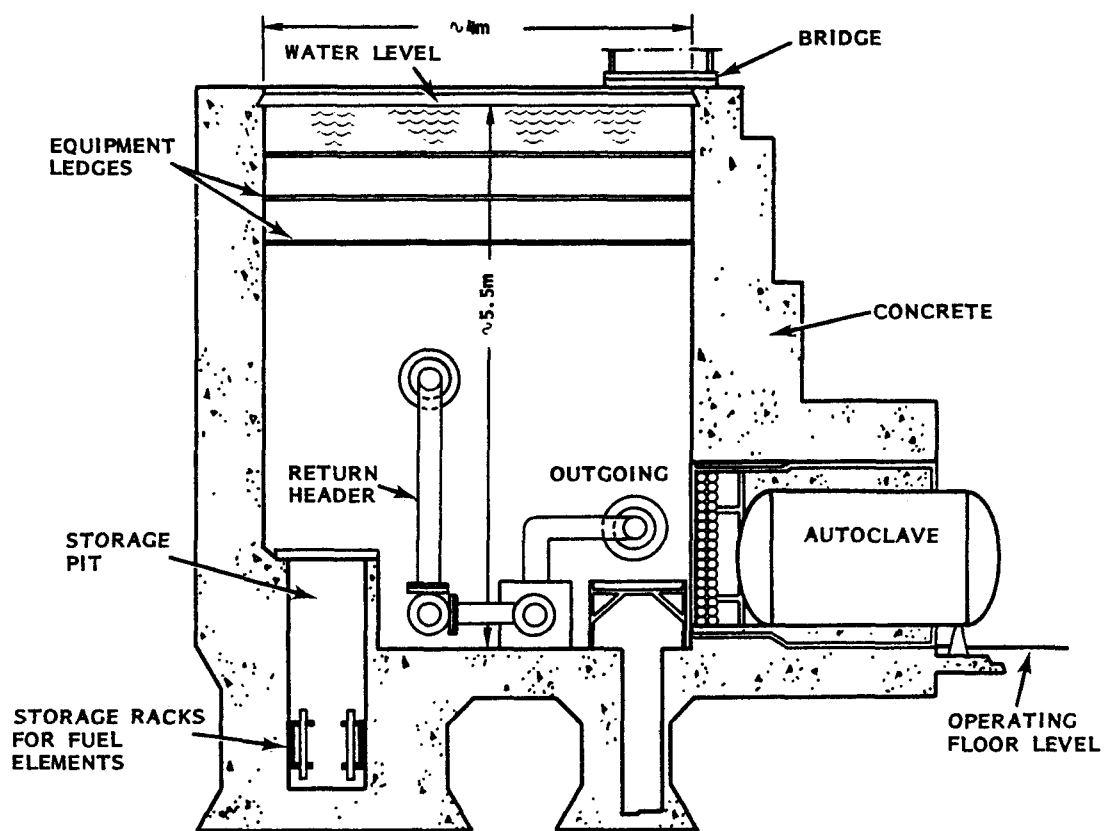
Vertical Section View of the Lynchburg Pool Reactor
